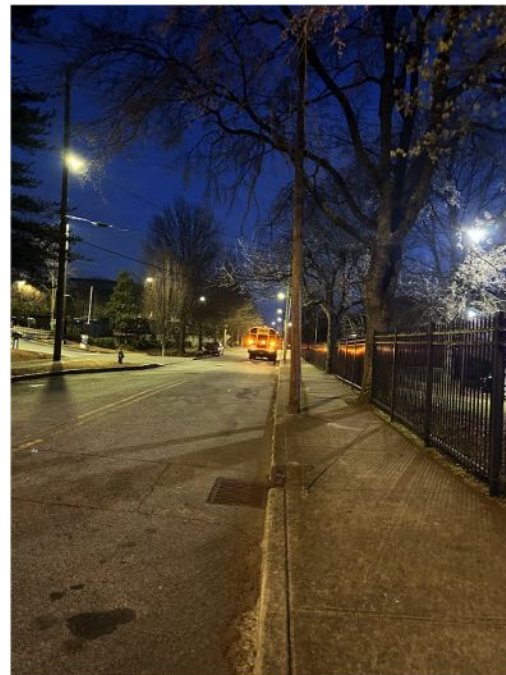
OVERHEAD STREET LIGHTING ALONG WHITEHALL TERRACE, NORTH OF THE SCHOOL
